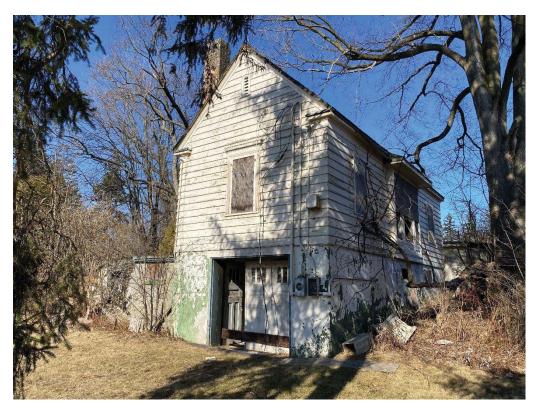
House Front Elevation; Deteriorated Roof and Building Envelope Collapsed Basement Roof at Front Door
